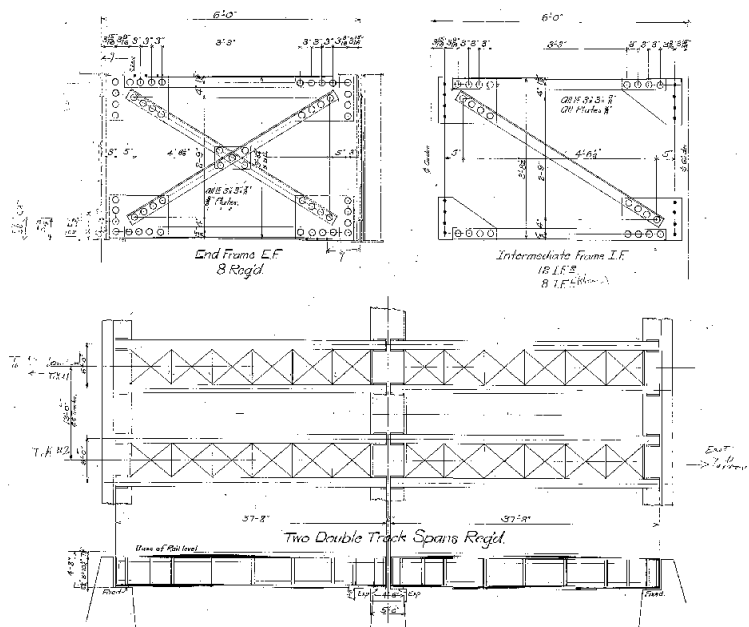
Span details of elevation, plan, and section views (N.Y. N.H. & H.R.R.).
